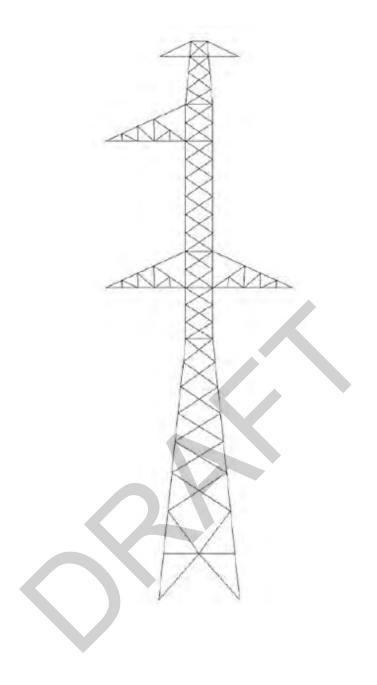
Proposed 400 kV Transposition Lattice Tower (Not to Scale) for the Proposed Development
